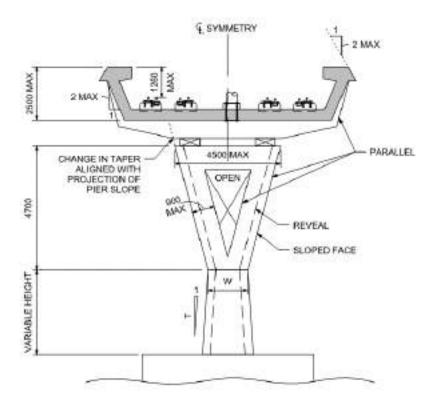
B: 87 Avenue Elevated Guideway Section – Trough Girder (dimensions in mm)
